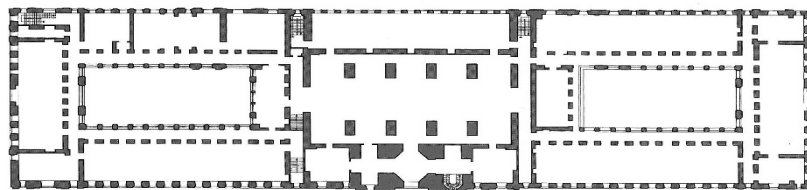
Post Building, ground floor plan. (Bani Masoud, 2012)
